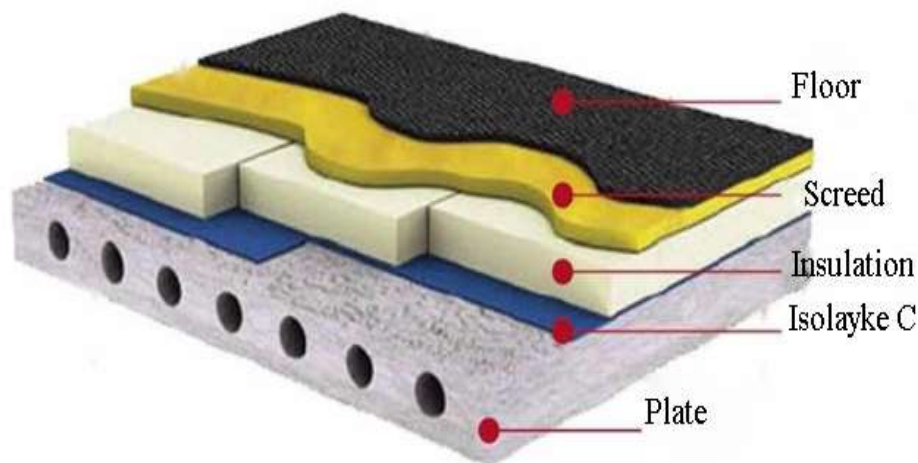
Insulation of a reinforced concrete attic slab under a screed
